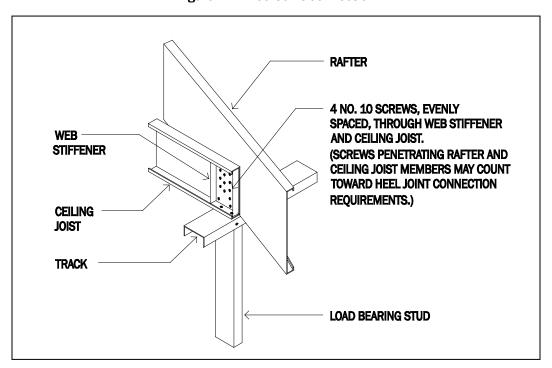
Bearing Stiffener at the Heel Joint Connection
